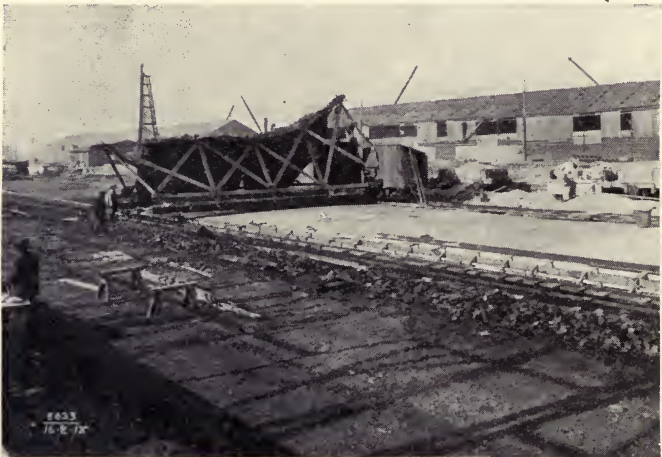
Reinforced concrete road in course of construction, showing the Road-laying Machine in use.
